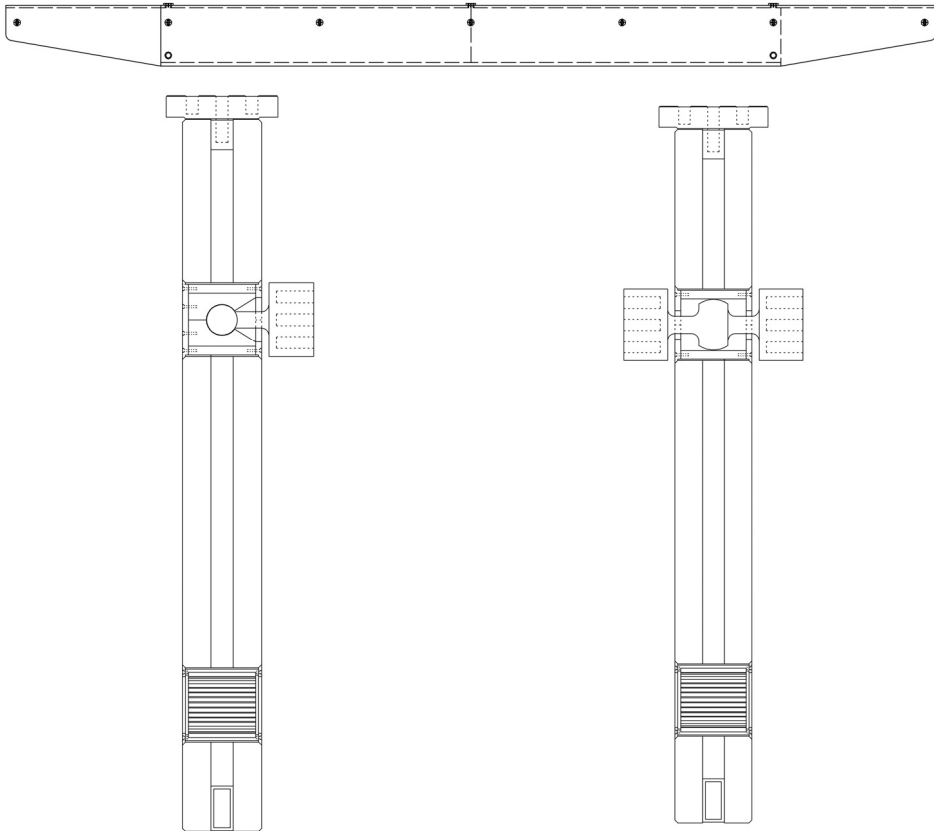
c ATP main beam: longitudinal view of end beam, section of end beam, section of mid beam.
